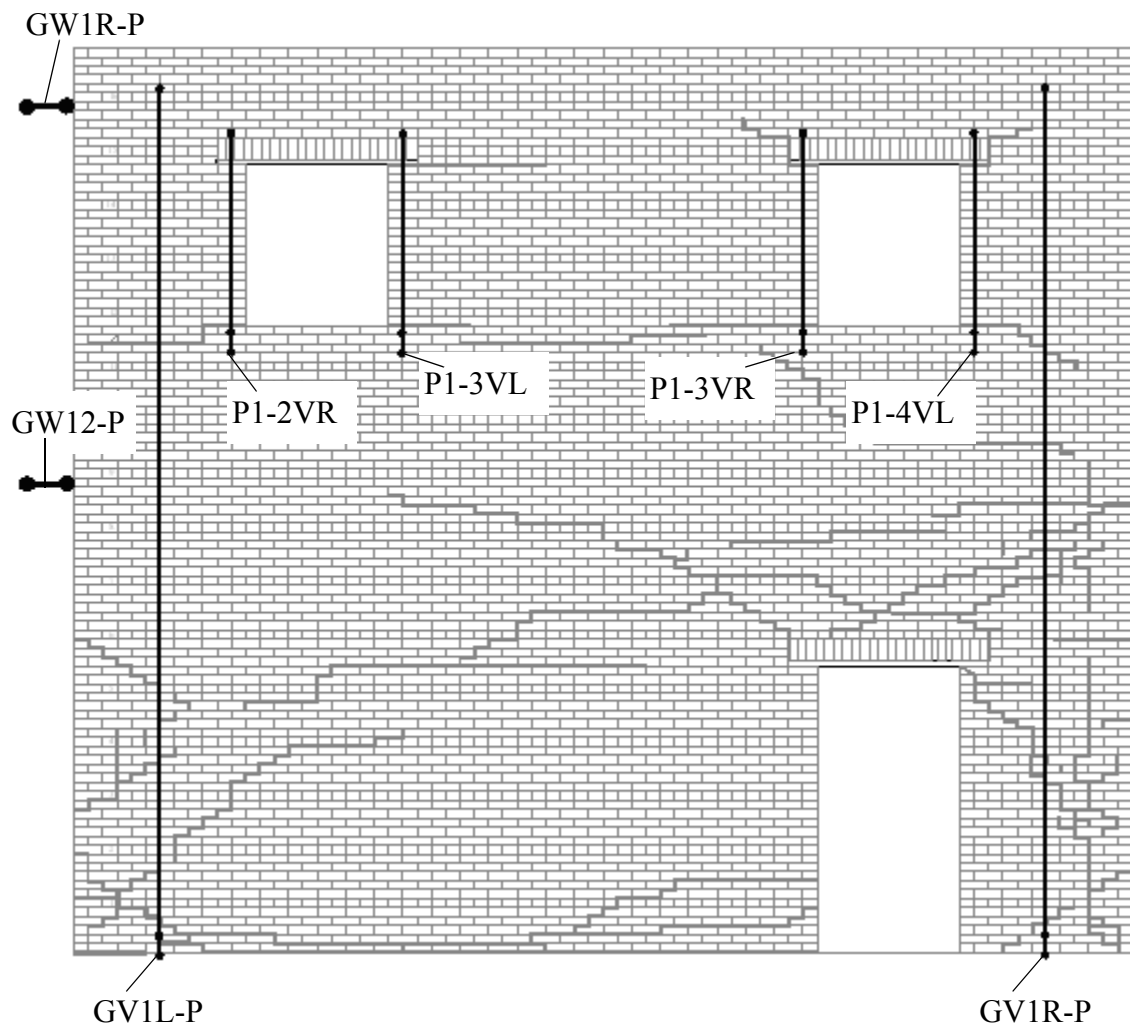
Elevation view of Wall 1 illustrating the location of potentiometers.
